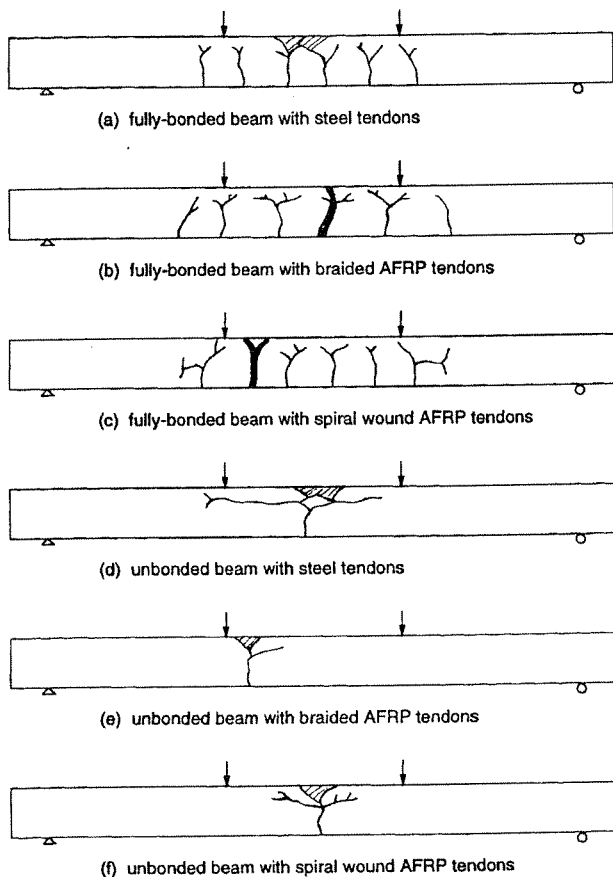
Crack patterns: fully-bonded and unbonded beams (schematic).
